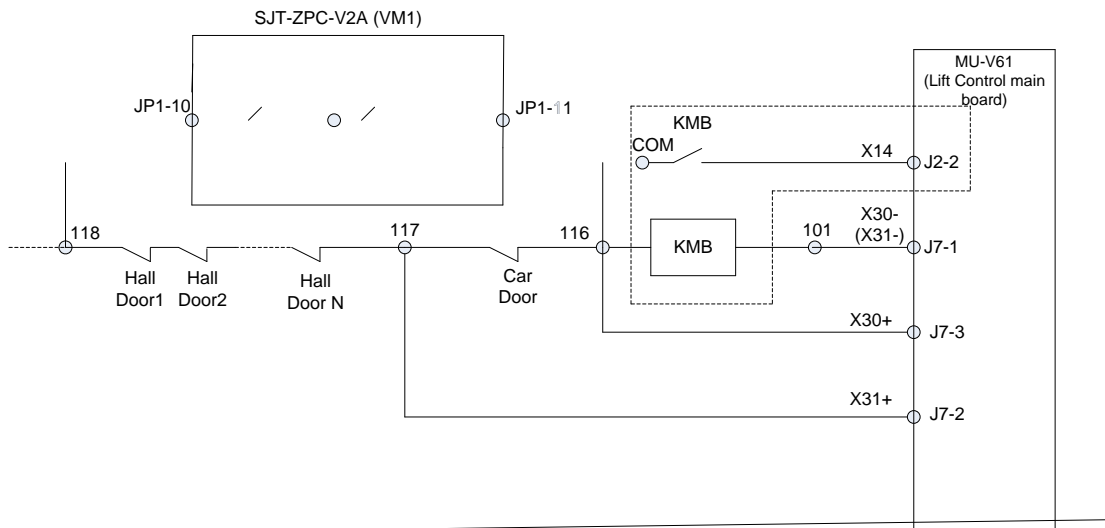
Advance door open & re-leveling & UCMP test & Door short detection control when single door (suit for gearless and geared machine)
